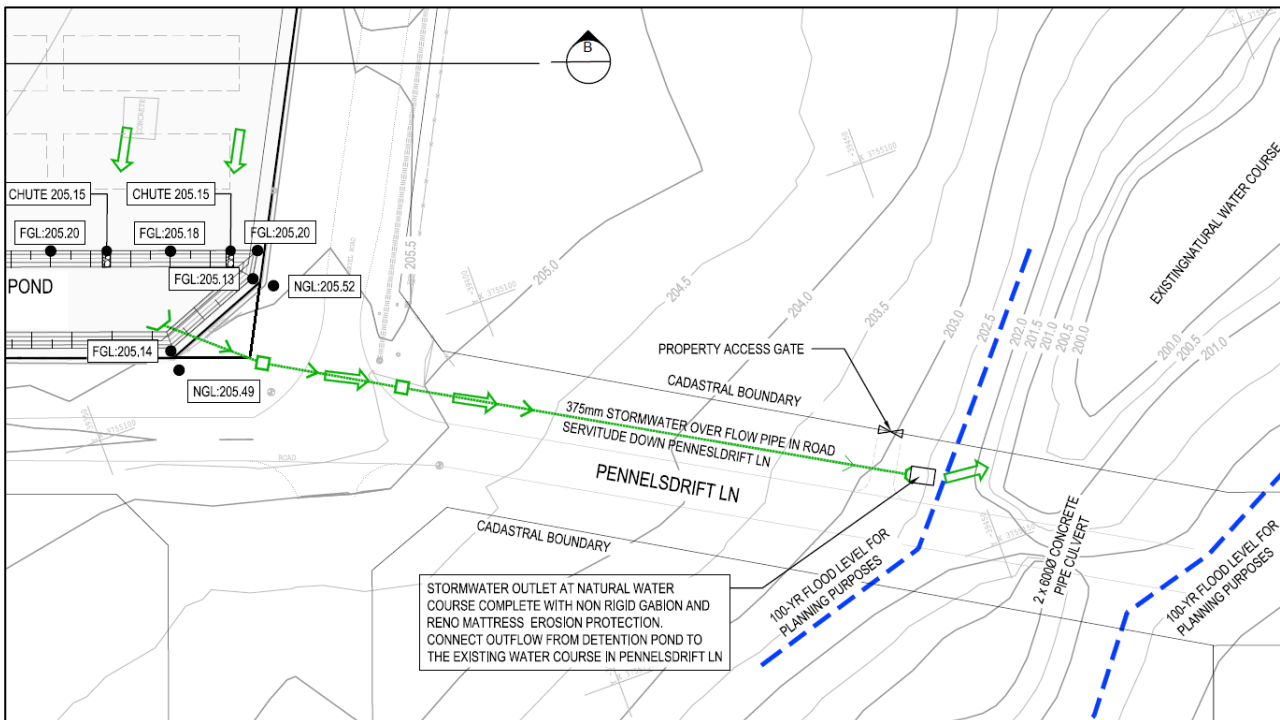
Stormwater management plan showing the proposed stormwater pipe extending from the site along the road reserve to the proposed stormwater outlet with reno mattress erosion protection.
